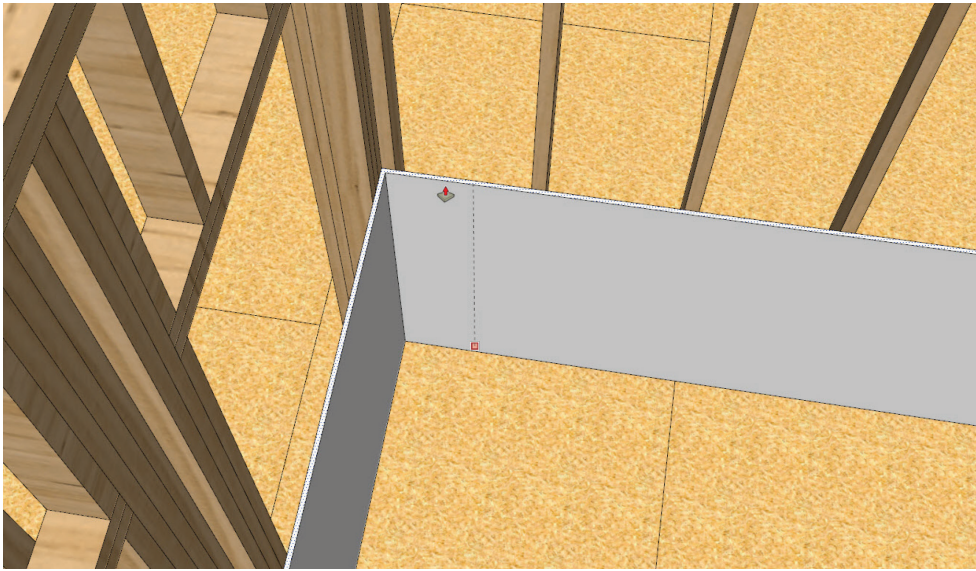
Push-Pull Drywall Face-Up Along Wall.
